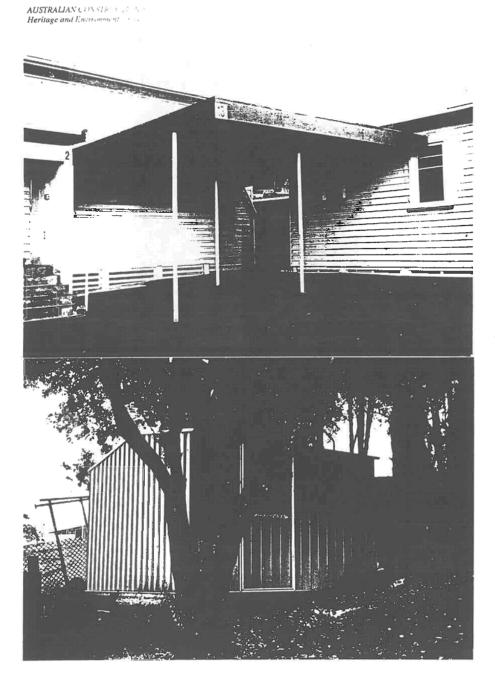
HMAS HUON, HOBART top: building 13, carport bottom: building 15, garden shed
